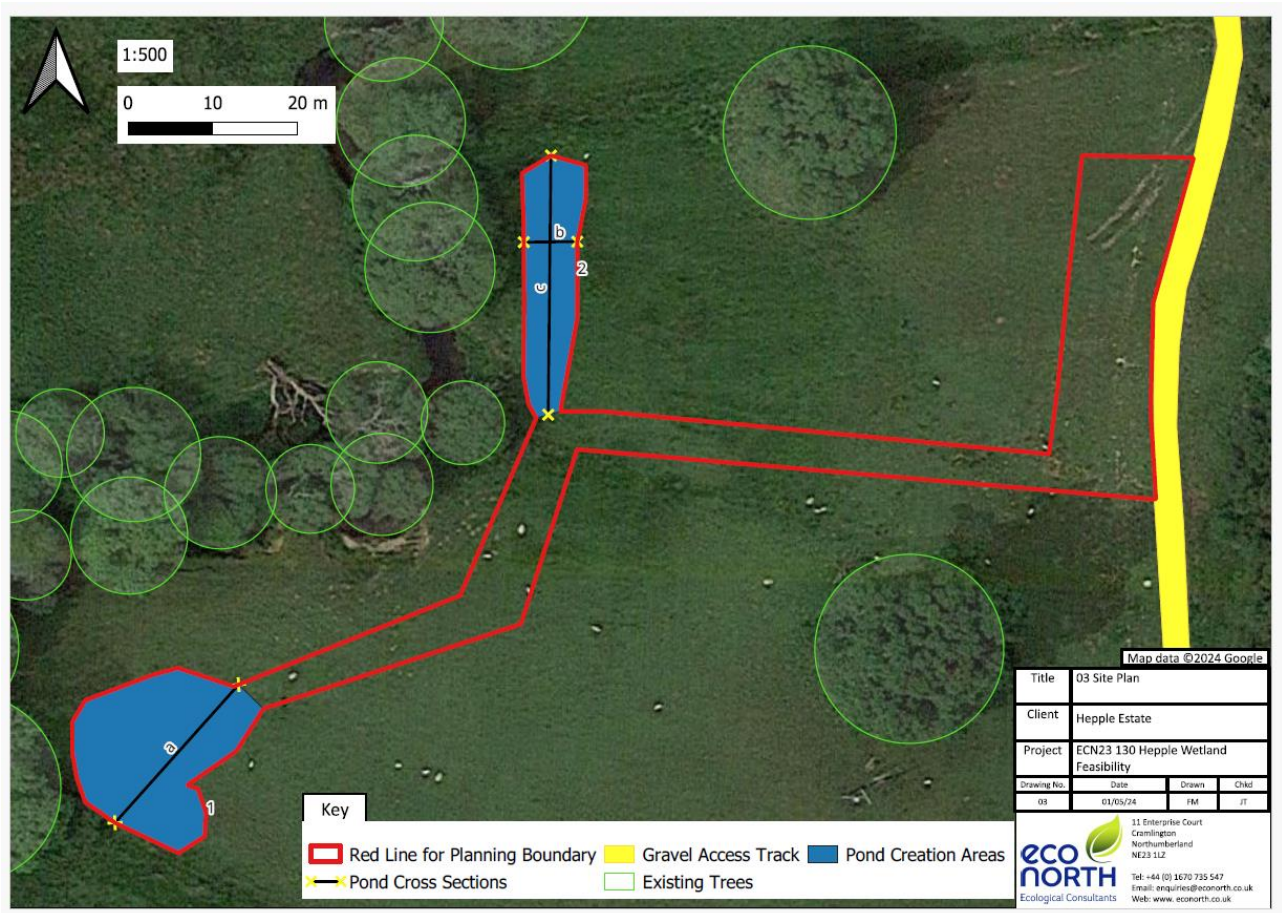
Site Plan 1:500 (Boundary outlined in red)
